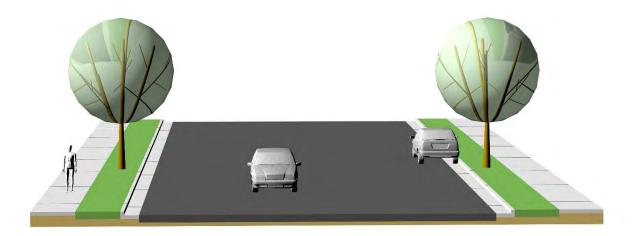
Rendering that shows the typical lack of striping on Corning streets
